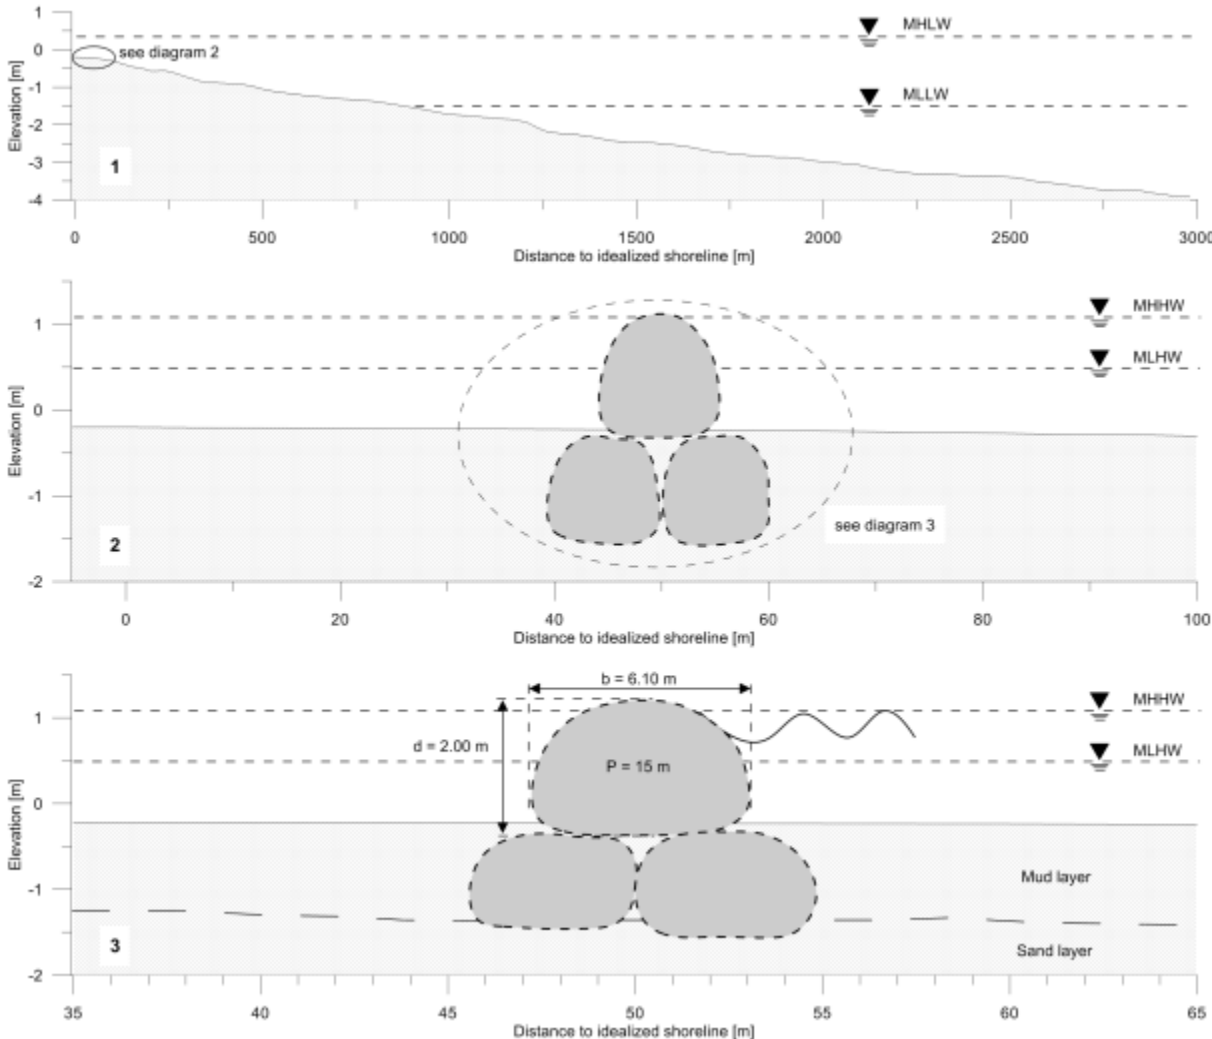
Arrangement of a breakwater constructed from Geotubes.
